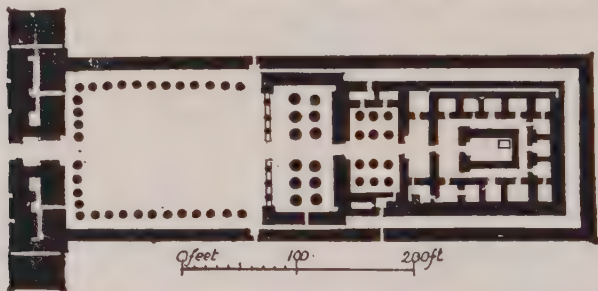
TEMPLE OF EDFOU. PLAN.
